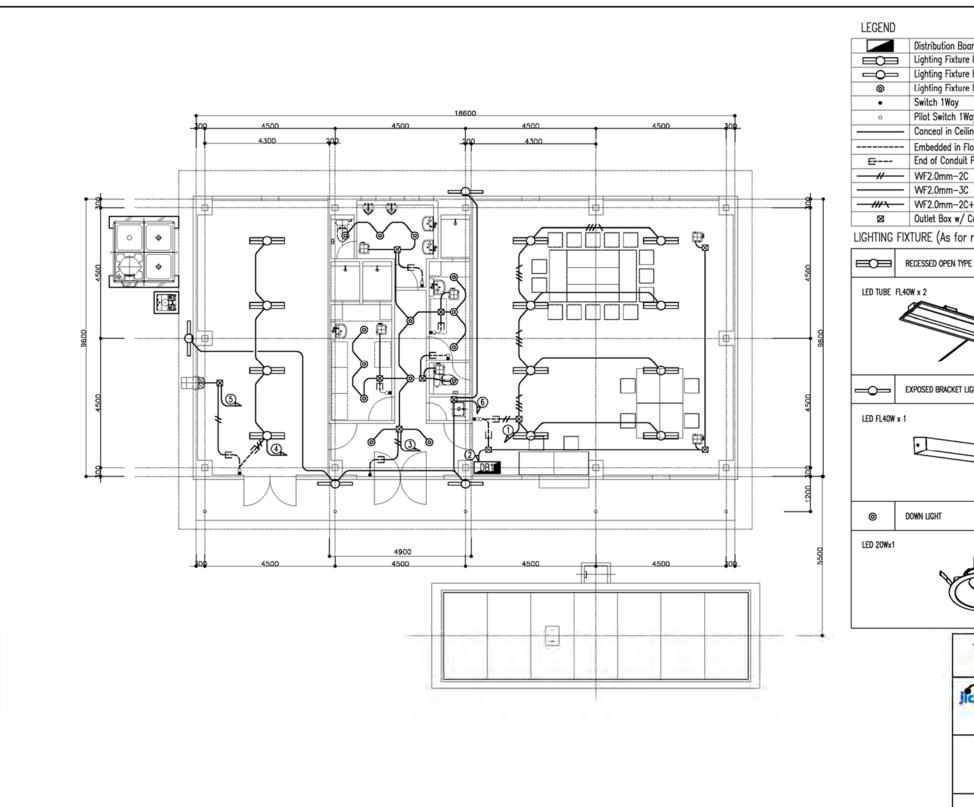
Electrical Facilities in Administration Building Lighting and Ventilation Wiring Plan
